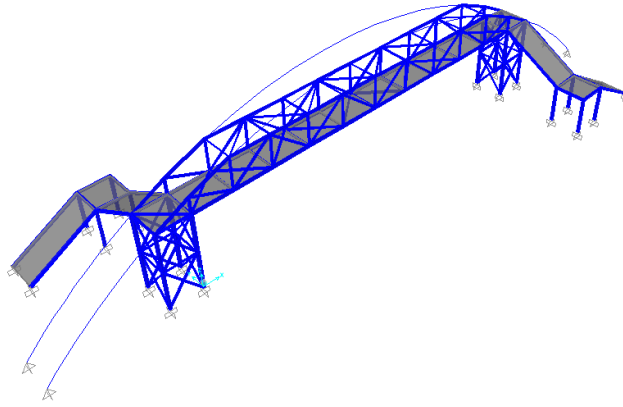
3D Model of the single span truss bridge (Capstone project)
